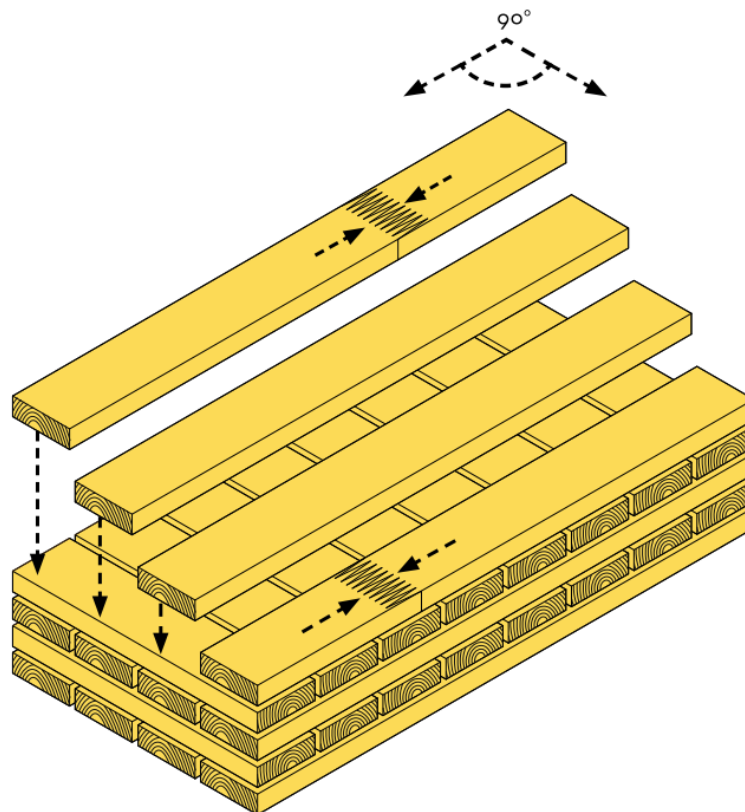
Cross-laminated timber (CLT) element, displaying solid and finger-jointed wood boards and the cross-glued direction of the boards (Waugh Thistleton Architects, 2018).
